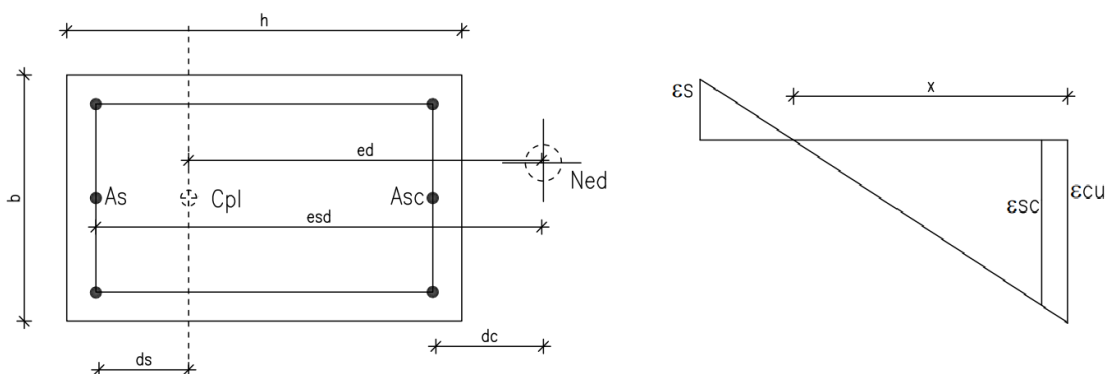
Stress distribution in columns (Leskelä 2008, 214)
